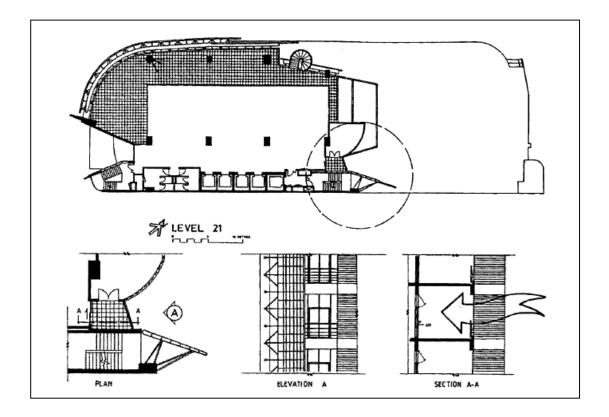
Menara UMNO Tower – Menara UMNO Tower – detail drawings of wing wall system (courtesy of TR Hamzah & Yeang Architects)
